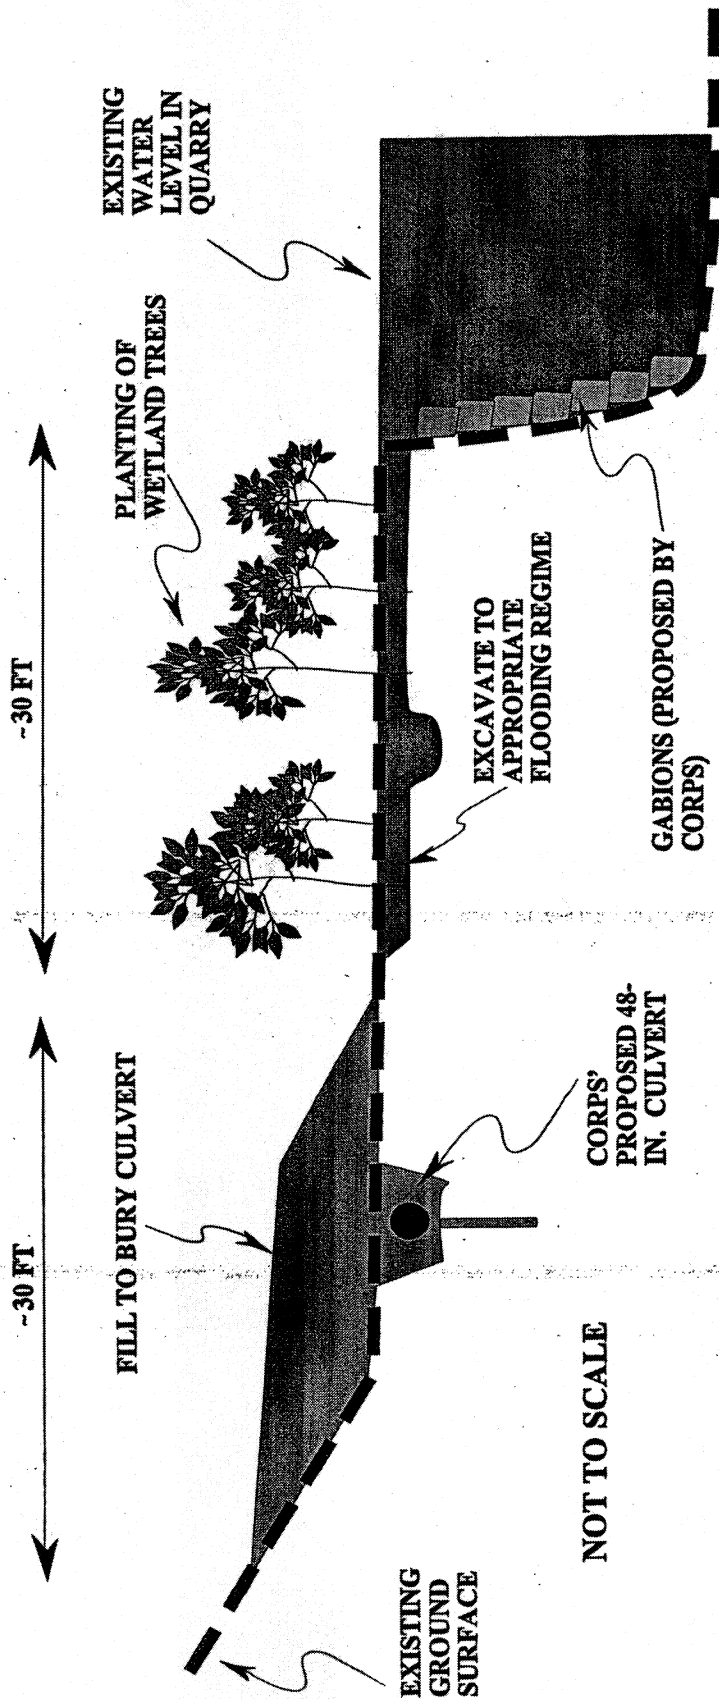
Schematic cross-section of proposed excavation of wetland shelf at Compensation Area 5. (See also Figure 4.)
